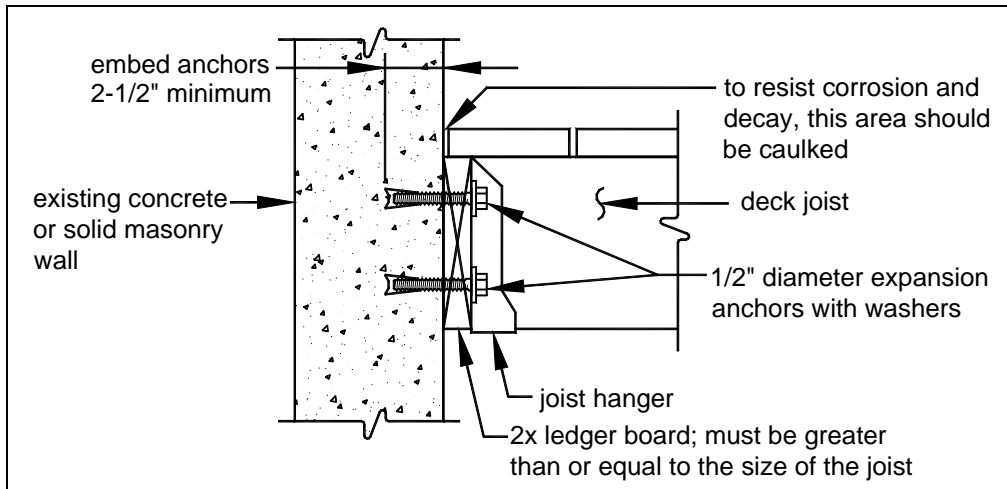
ATTACHMENT OF LEDGER BOARD-TO-FOUNDATION WALL (CONCRETE OR SOLID MASONRY)
